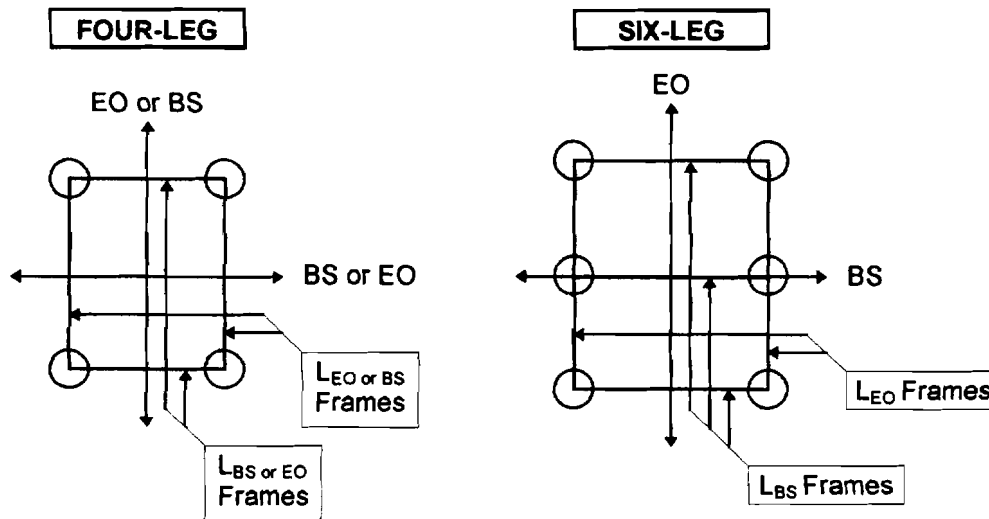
A: Plan View of Pile Layouts Assumed by TOPCAT for Standard Jackets
